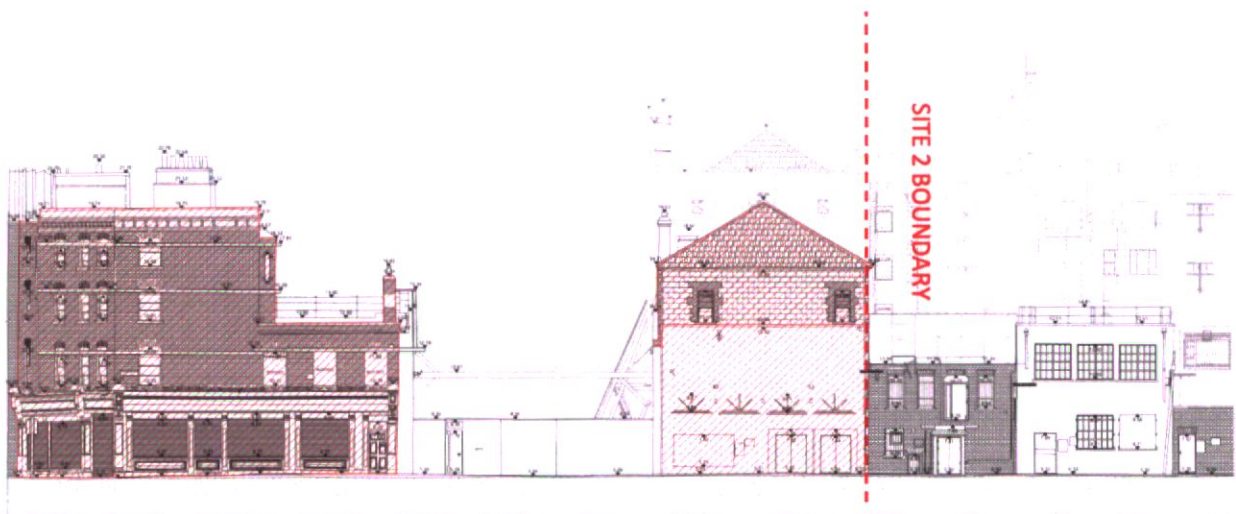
Extract from Moore Lane Fabric- pre 1916 sketch with pre 1916, shown hatched in red (within Site 1, outside the subject planning boundary)
